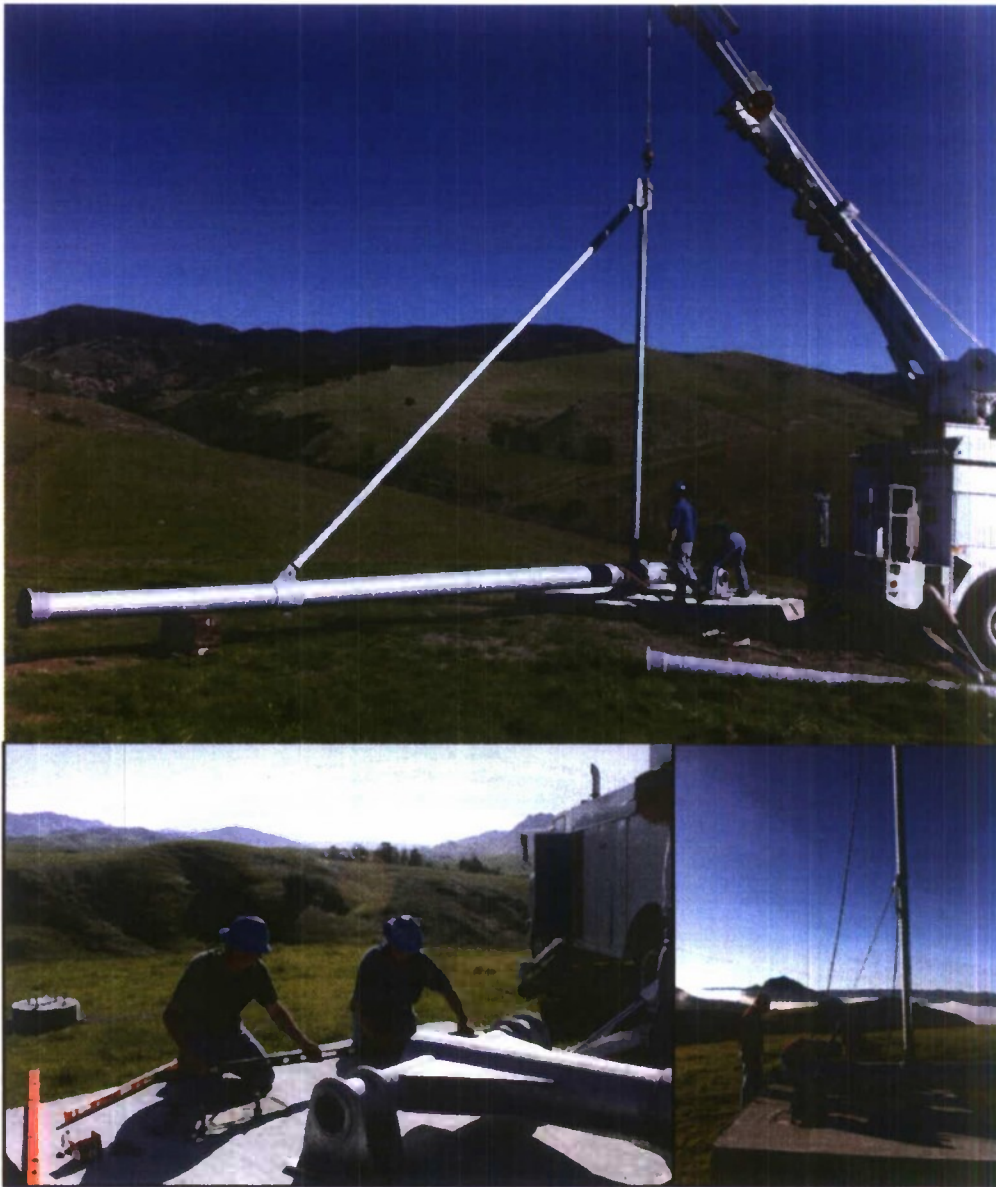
TOWER ASSEMBLY. THE ASSEMBLY OF THE TOWER TOOK TWO DAYS AND REQUIRED THE USE OF A CRANE, SHOWN IN THE TOP PHOTO SUPPORTING THE GINPOLE IN PLACE. THE TWO LOWER PICTURES SHOW STEPS IN THE MAIN BEARING ASSEMBLY, A KEY COMPONENT OF THE NEW TOWER DESIGN. WE DEVELOPED A DETAILED PROCEDURE FOR THE ENTIRE ASSEMBLY, PRIOR TO THE START OF FIELD WORK.
